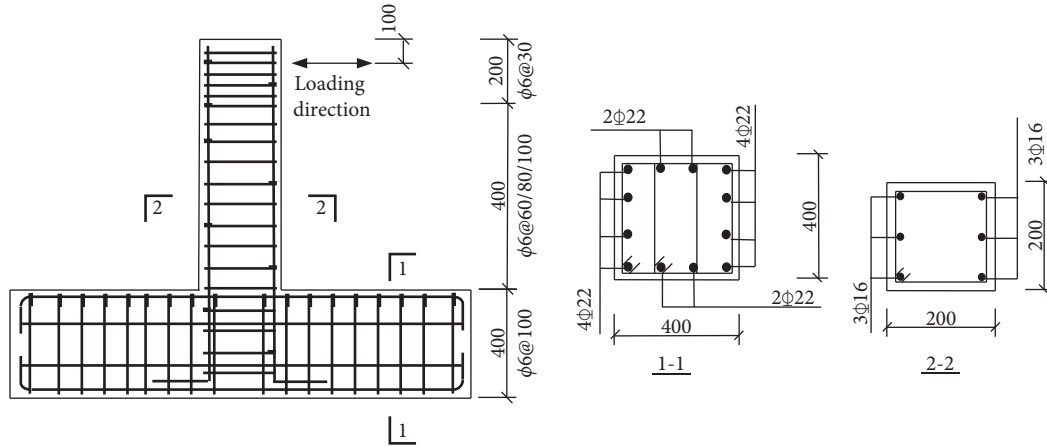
Geometric dimensions and steel bar layout of the column specimens (unit: mm).
